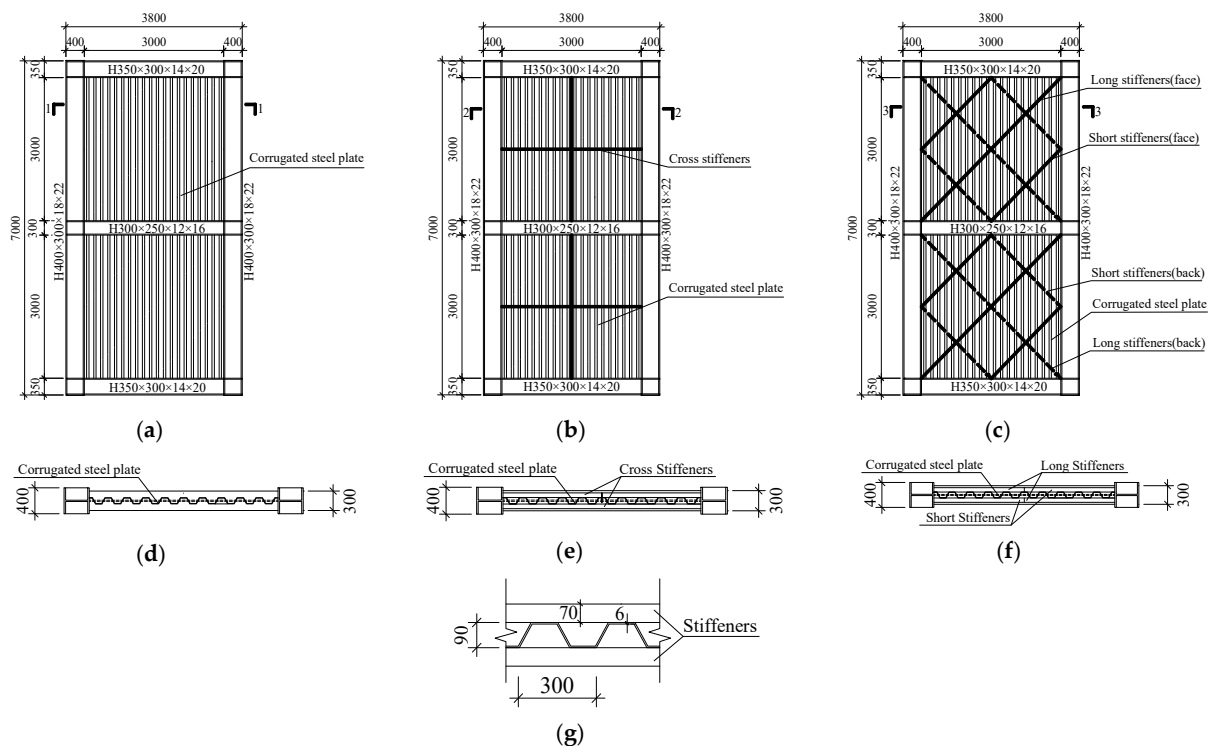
Dimension details of USW, CSW and ASW: (a) USW; (b) CSW; (c) ASW; (d) the profile of Section 1-1; (e) the profile of Section 2-2; (f) the profile of Section 3-3; (g) the dimensions of corrugated steel plate.
